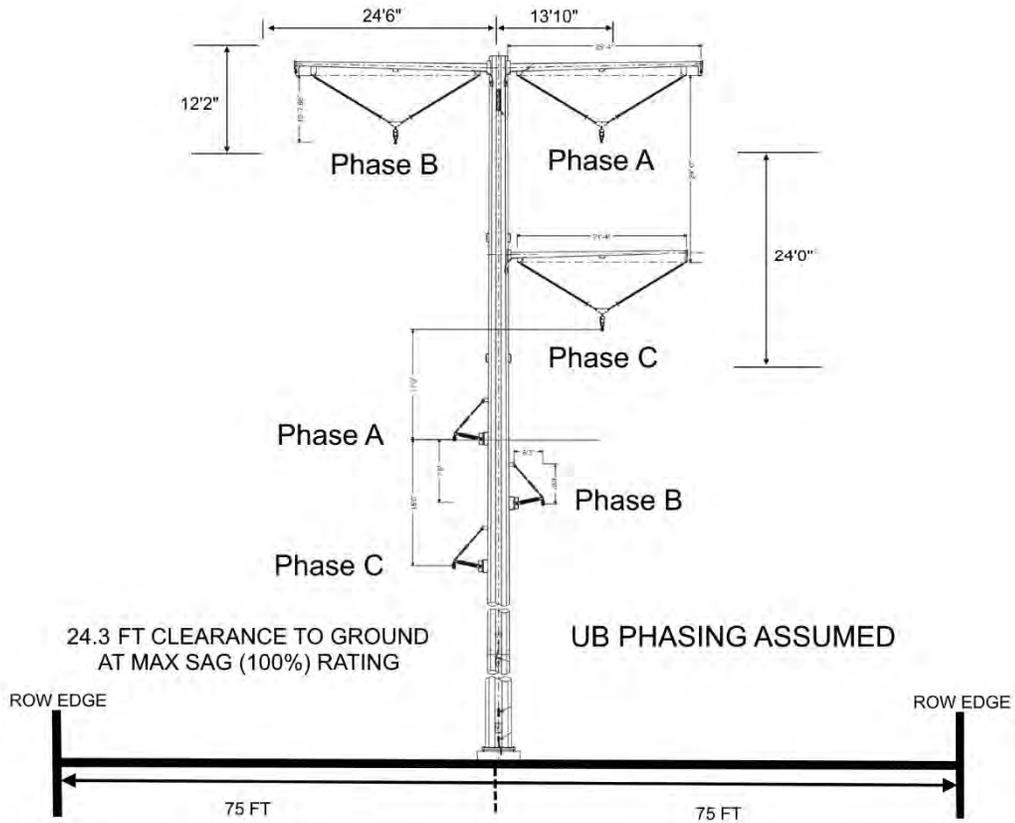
West Faribault – North Rochester Circuit with 69 kV Underbuild
